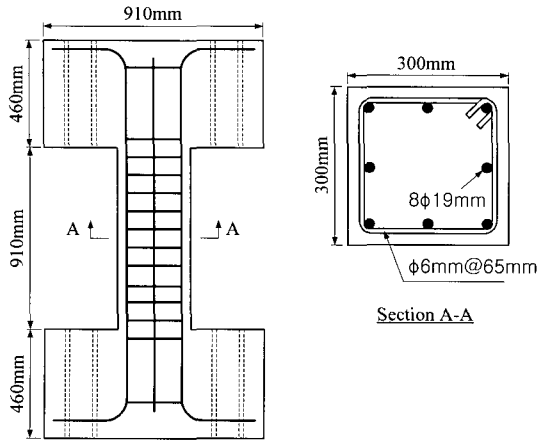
Dimensions and cross-section details of test specimen<sup>14)</sup>
